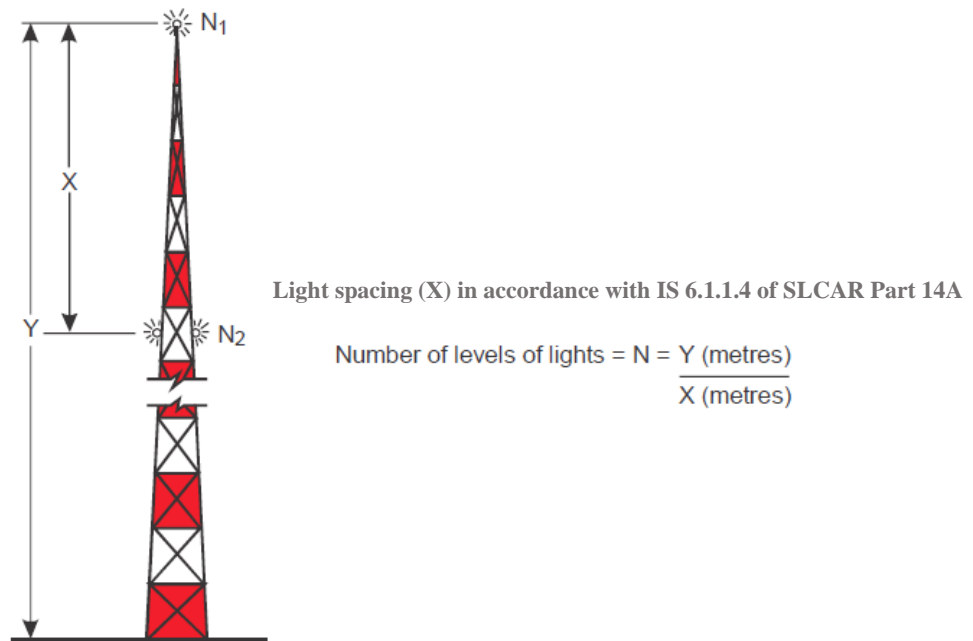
(a): Lighting of tall structures (No. and Spacing)
